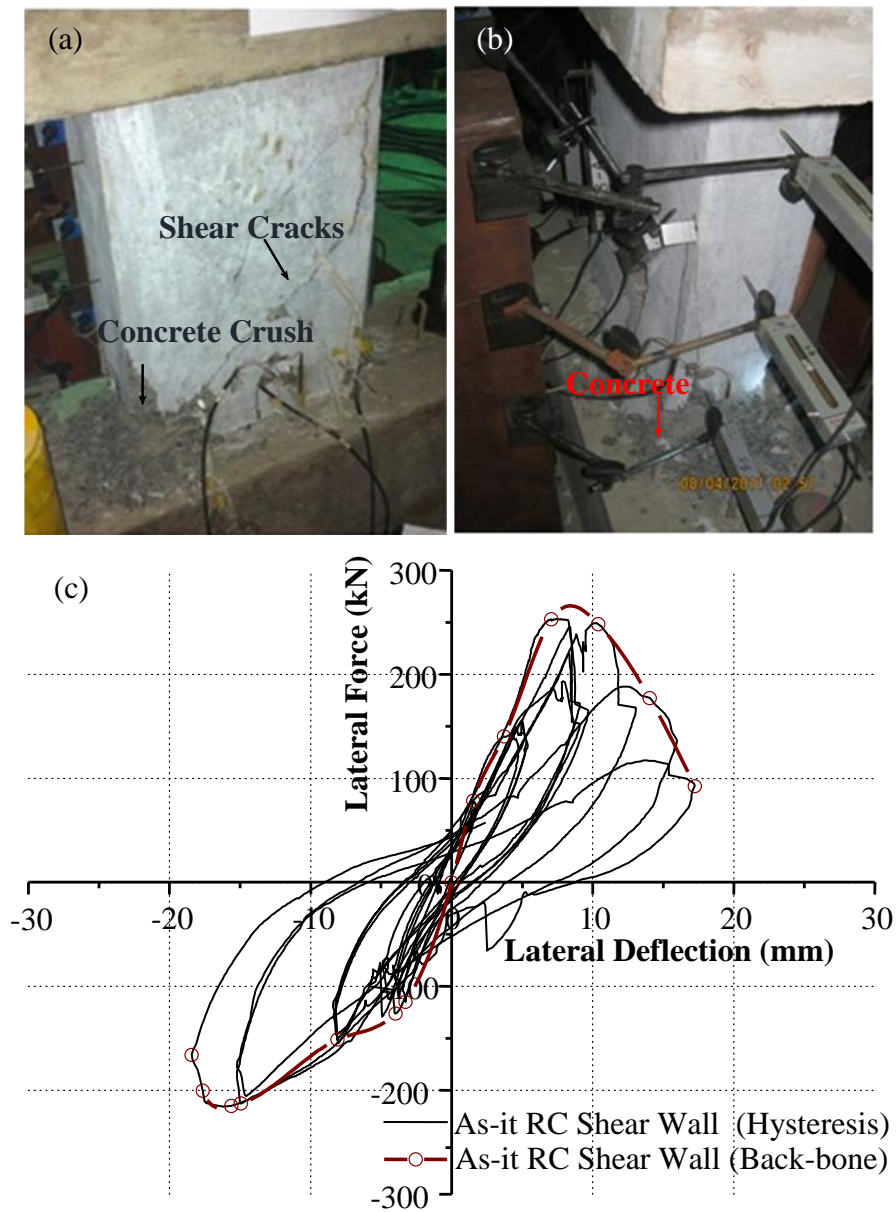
Test results of the as-built shear wall: (a) shear wall damage (front view); (b) shear wall damage (side view); (c) hysteresis and back-bone curves of the lateral load vs. deflection
